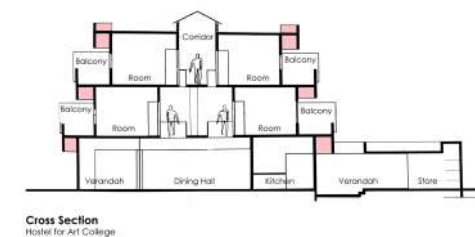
Cross section of the building showing the real beam width, which is covered on the façade.
